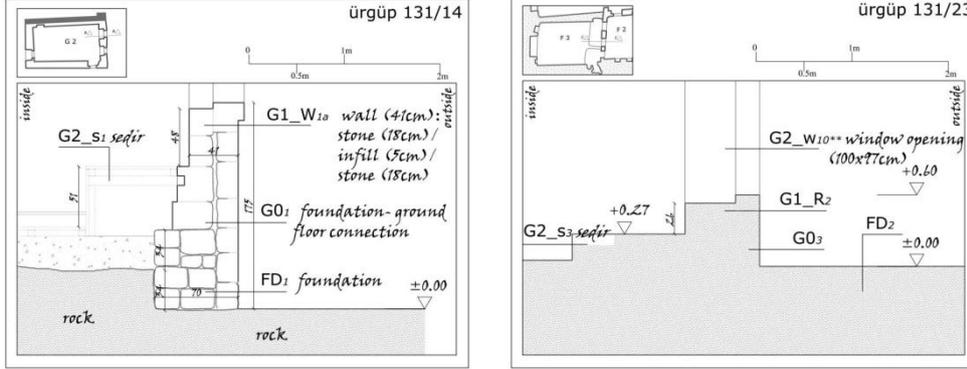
, Detail of foundation type 1- Detail of foundation type 2
